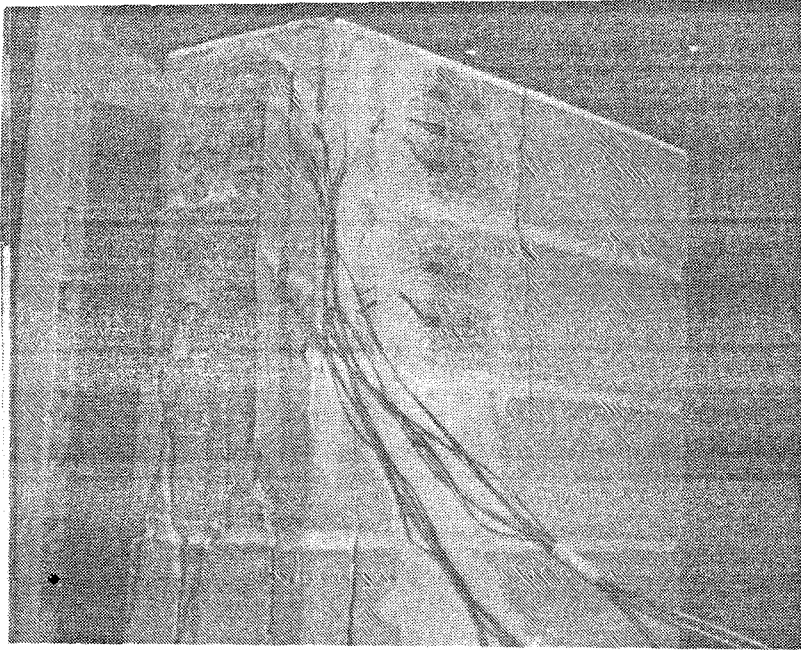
FAILURE OF CONCRETE PRISM
